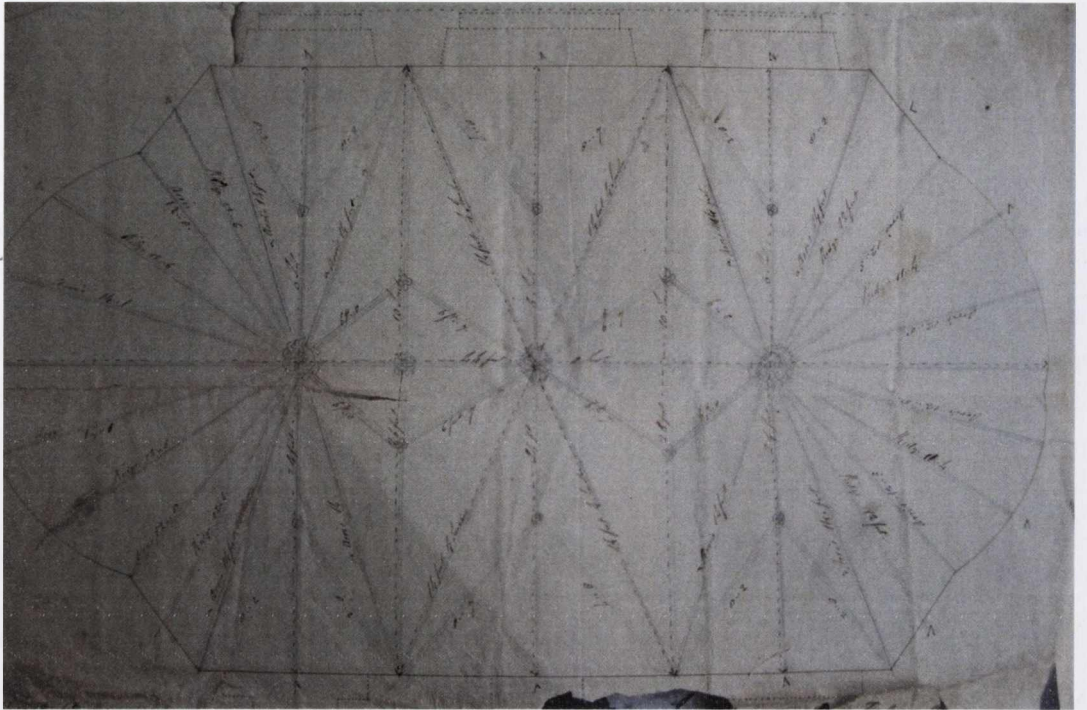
Birr Castle, plan for vaulted ceiling in new drawing room, (realized) attrib. to John Johnston, [1804–1805], Rosse papers, O/18/2.
